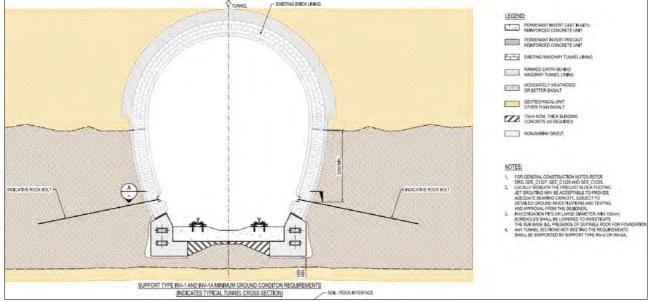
TYPICAL CROSS SECTION THROUGH TUNNEL LINING. (SOURCE: AURECON/VLINE) NOTE FOR PFC INSTALLATION AND ROCK BOLT SUPPORT TO TUNNEL LINING REFER SECTION 3.1.4.
